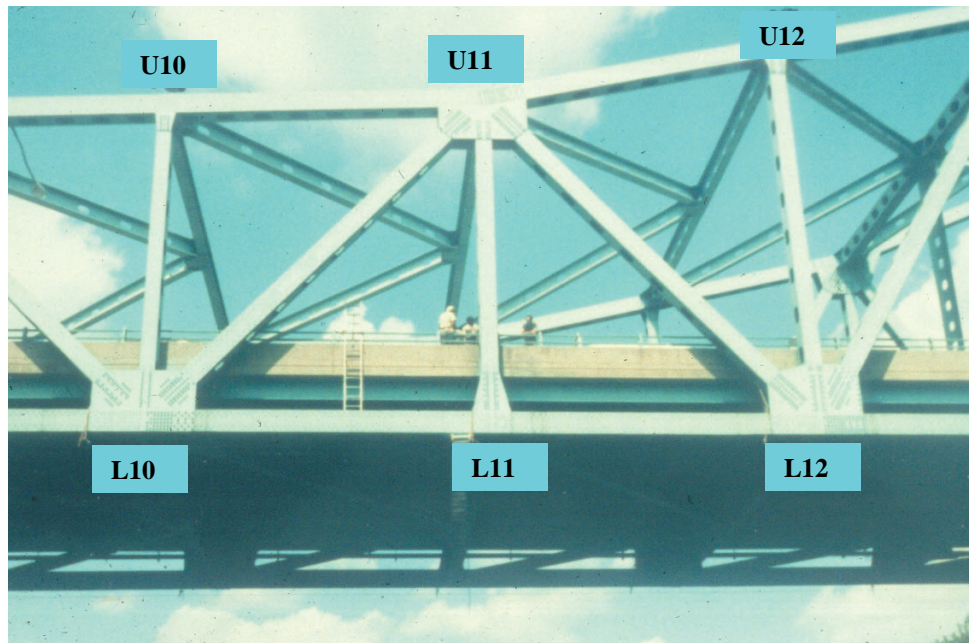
Truss Panel Point using Shop Rivets and Field Bolts
